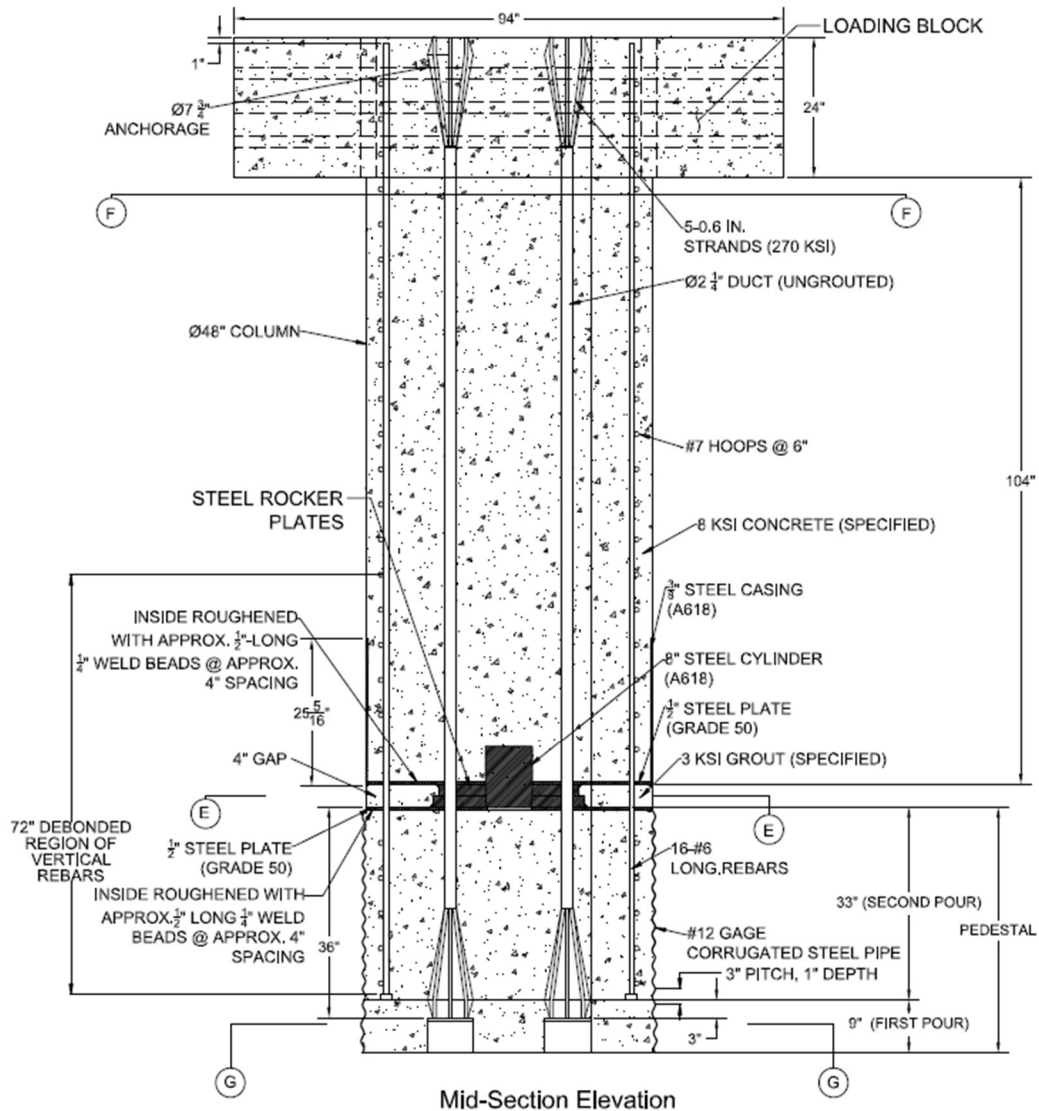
Elevation view of Specimen 1 with reinforcement details
